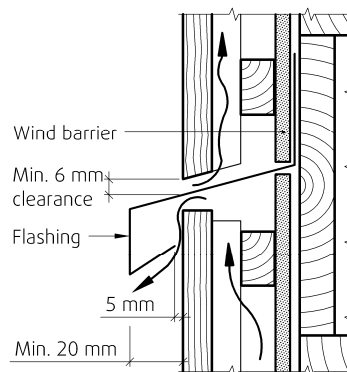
Design of a wall break (Kvande et al. 2007).
